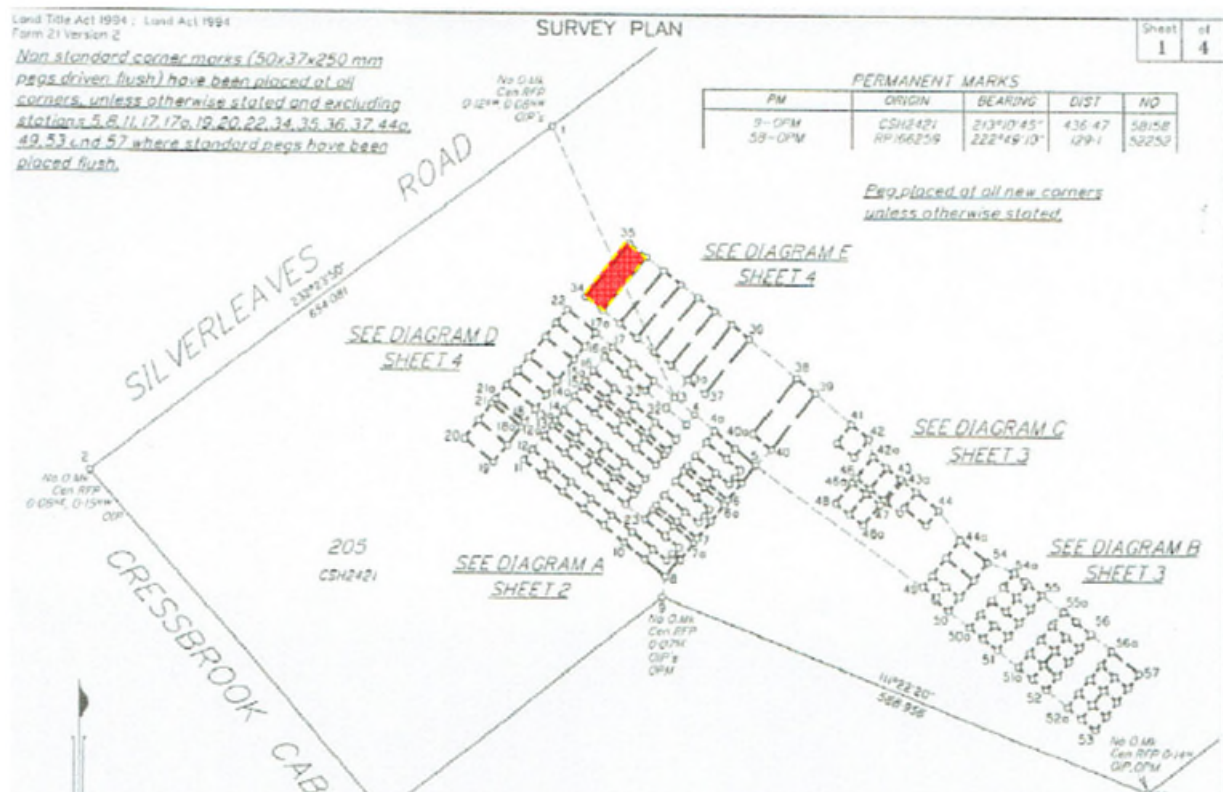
Overall site plan highlighting the location of “CHAD” (Reference: Appendix A Survey Plan)
